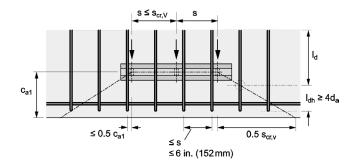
REQUIREMENTS FOR DETAILING OF ANCHOR REINFORCEMENT OF ANCHOR CHANNELS
